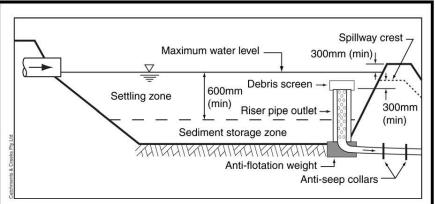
Type C Sediment Basin with riser pipe outlet (long section)
